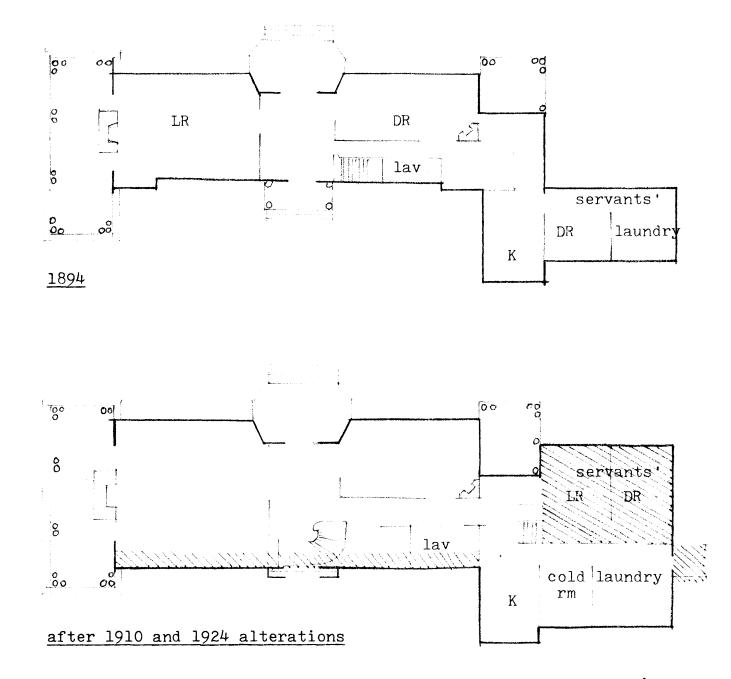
J.H. WHITTEMORE SUMMER RESIDENCE GROUND FLOOR PLAN
